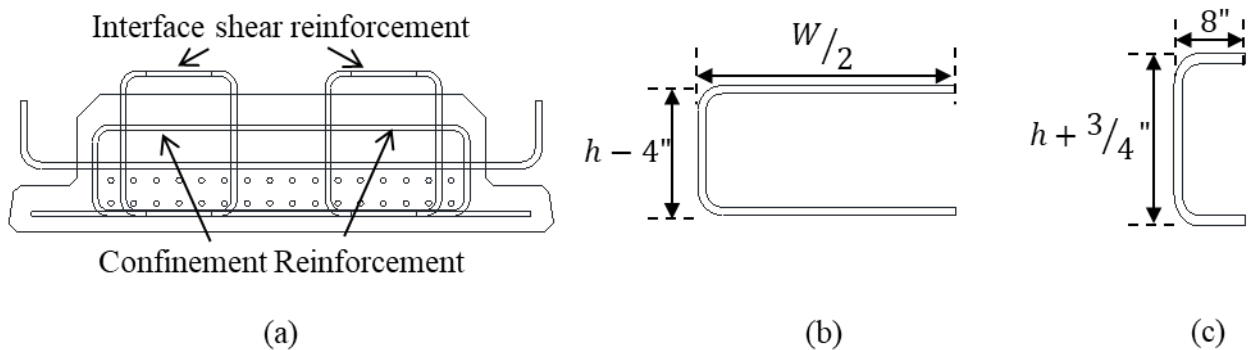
(a) Original FSB shear reinforcement, (b) confinement stirrup, and (c) interface stirrup
